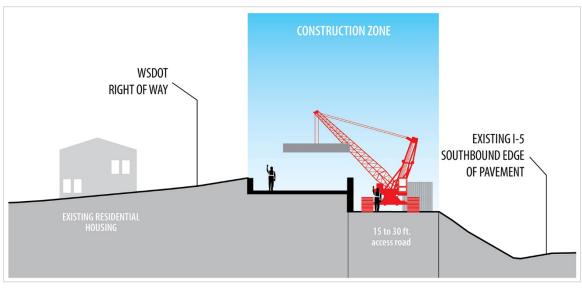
I-5 Construction (Typical Cross-Section)
